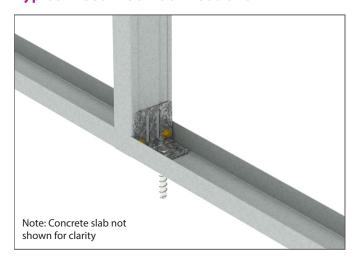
Base Track Connection BC4 using UB60 Heavy Duty Connection for 64mm and 76mm studs Perspective
